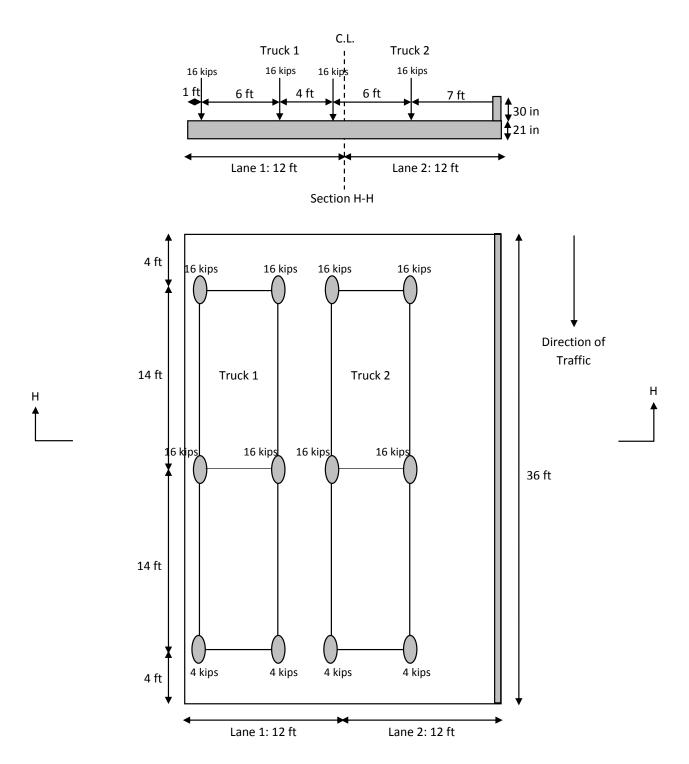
Typical Cross-Section and Plan of a Two-Lane 36 ft Span Straight Bridge with One Railing under Edge Loading E1.
